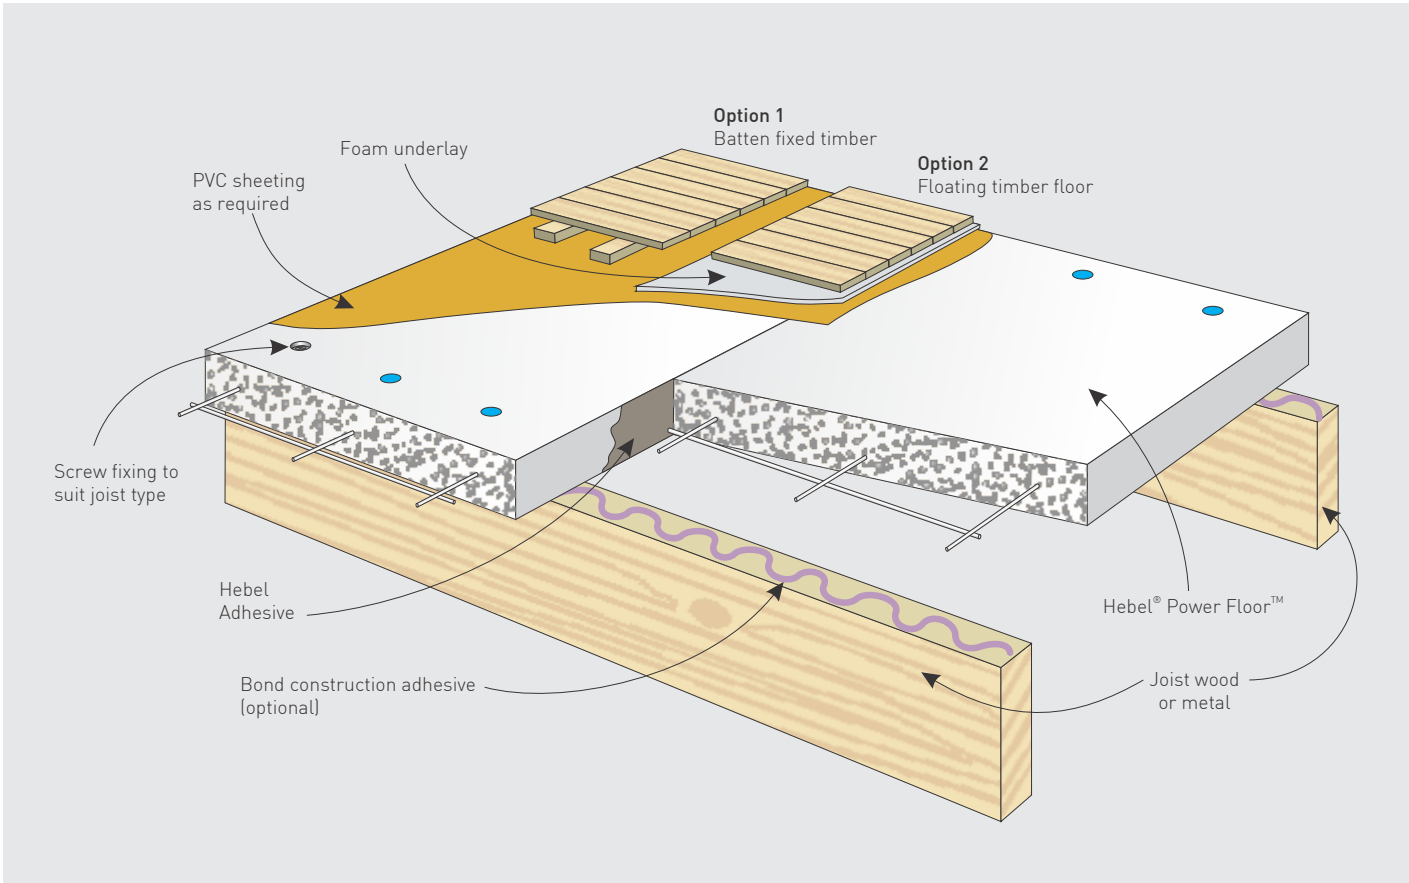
Hebel® Power Floor™ System Timber Floors.
